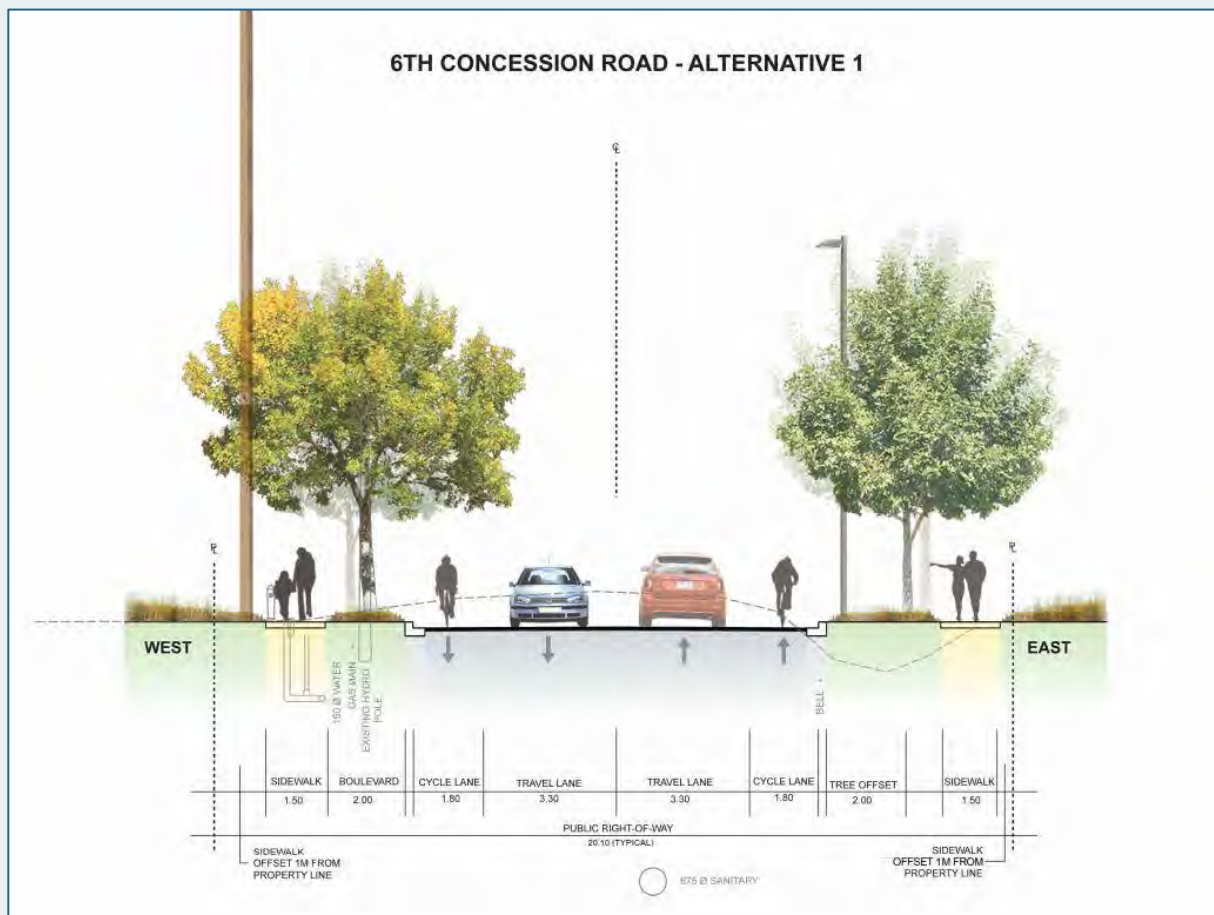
ALTERNATIVE 1 – SIXTH CONCESSION ROAD
